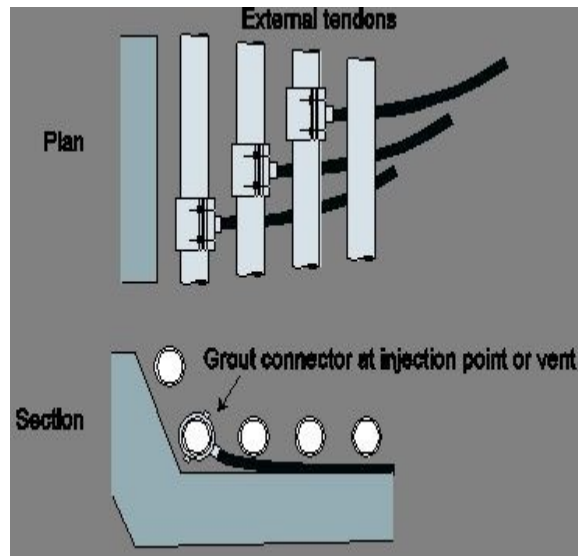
Possible grout and drainage connections for bottom external tendons
